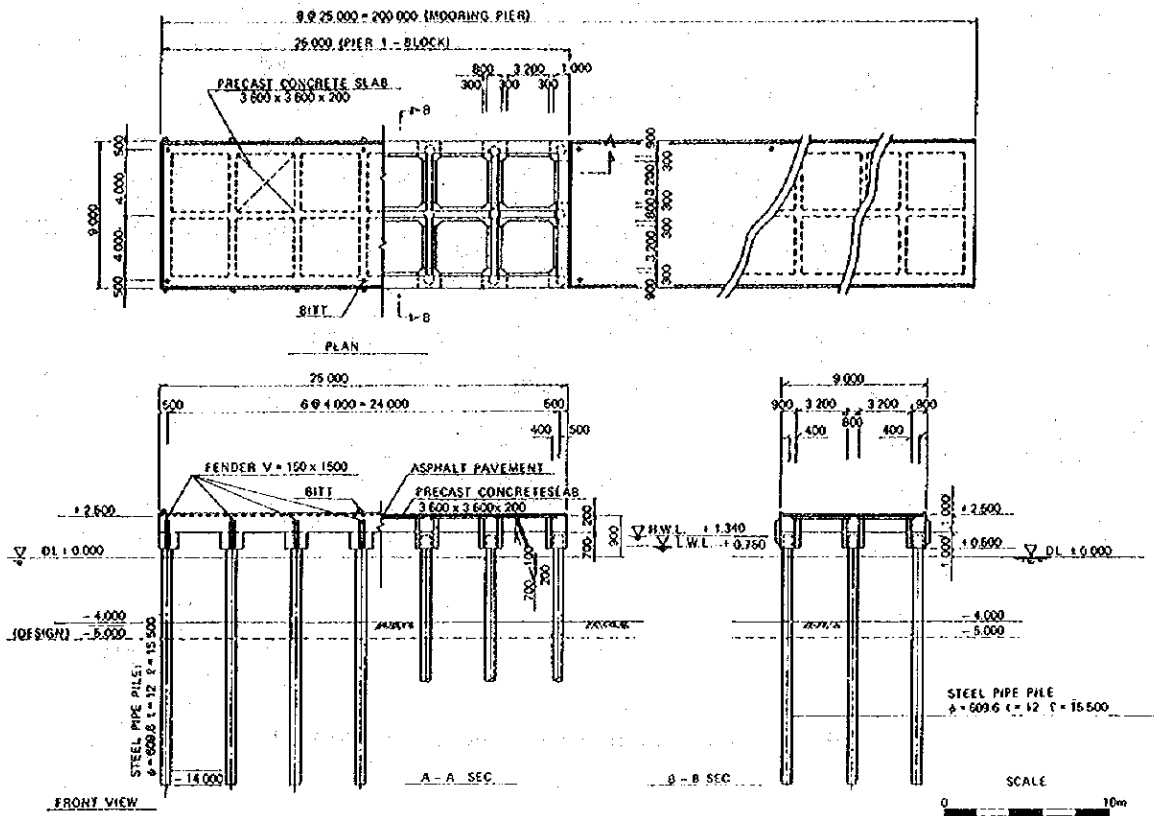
Cross Section of Mooring Pier – Hoilo Port
